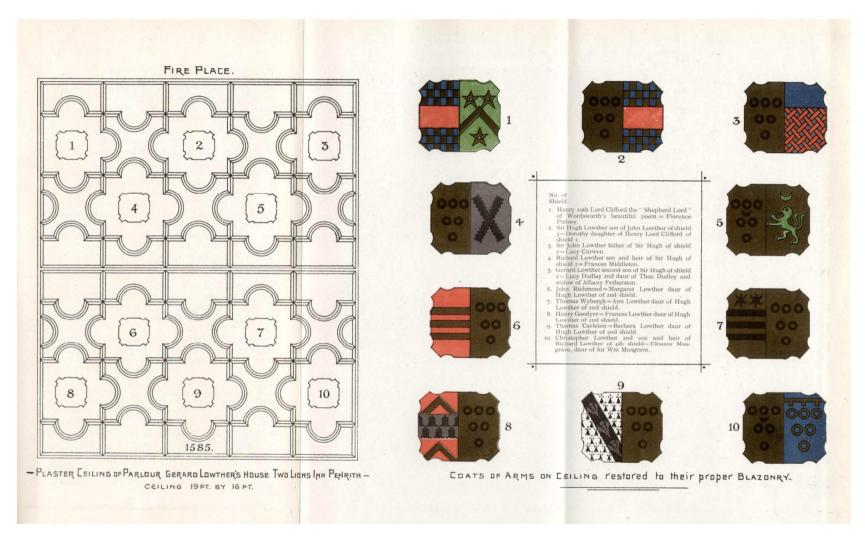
Plan of the plaster ceiling in the parlour, showing detail of coats of arms (Watson 1901)
